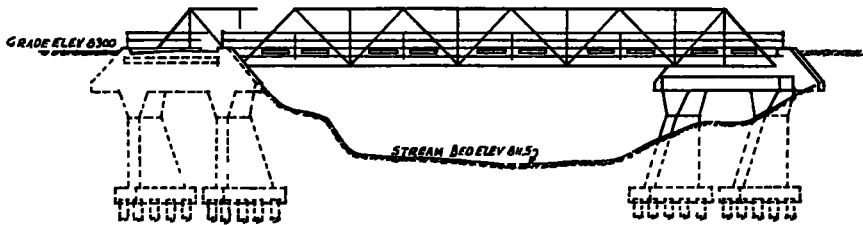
Efficient Pile Foundation. From Amer. Inst. Steel Constr.: "Highway Bridge Design"
